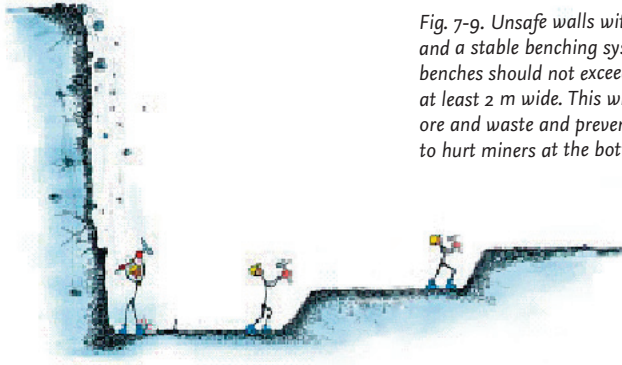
Unsafe walls with rock fall on the left and a stable benching system on the right. The benches should not exceed 1.5 m in height and be at least 2 m wide. This will facilitate carrying up ore and waste and prevent material falling down to hurt miners at the bottom of the pit.
